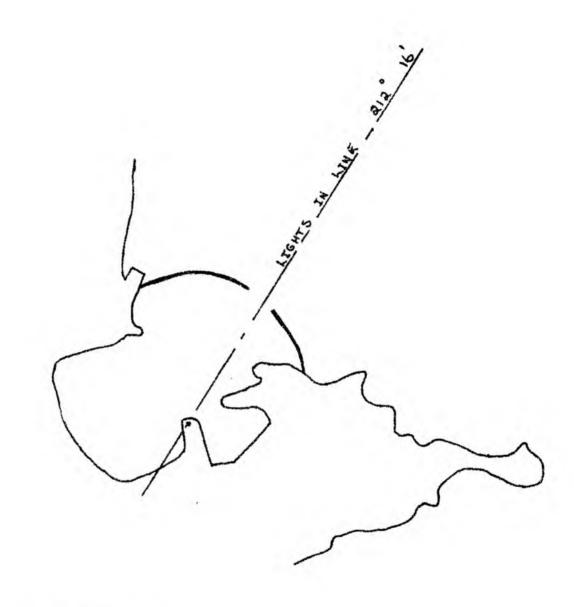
PROPOSED LOCATION OF BREAKWATER WALLS.
